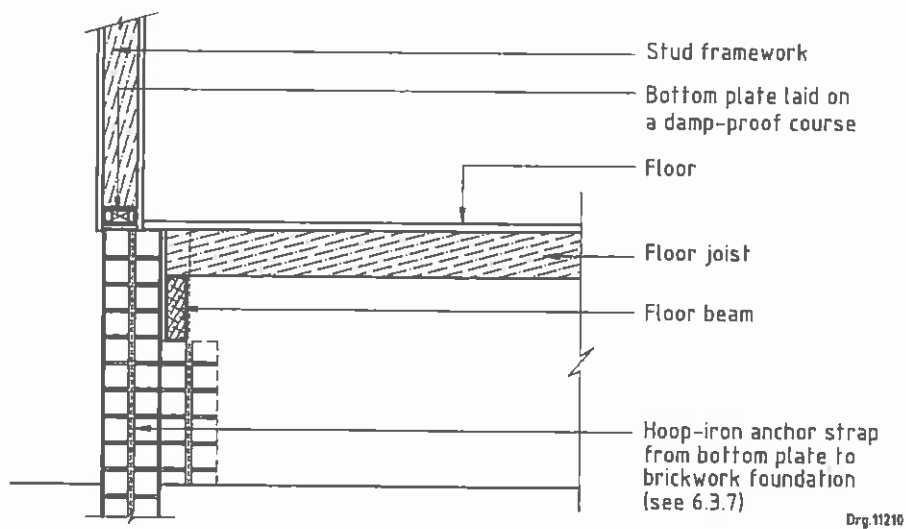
Balloon frame construction — First floor framing over load-bearing wall
